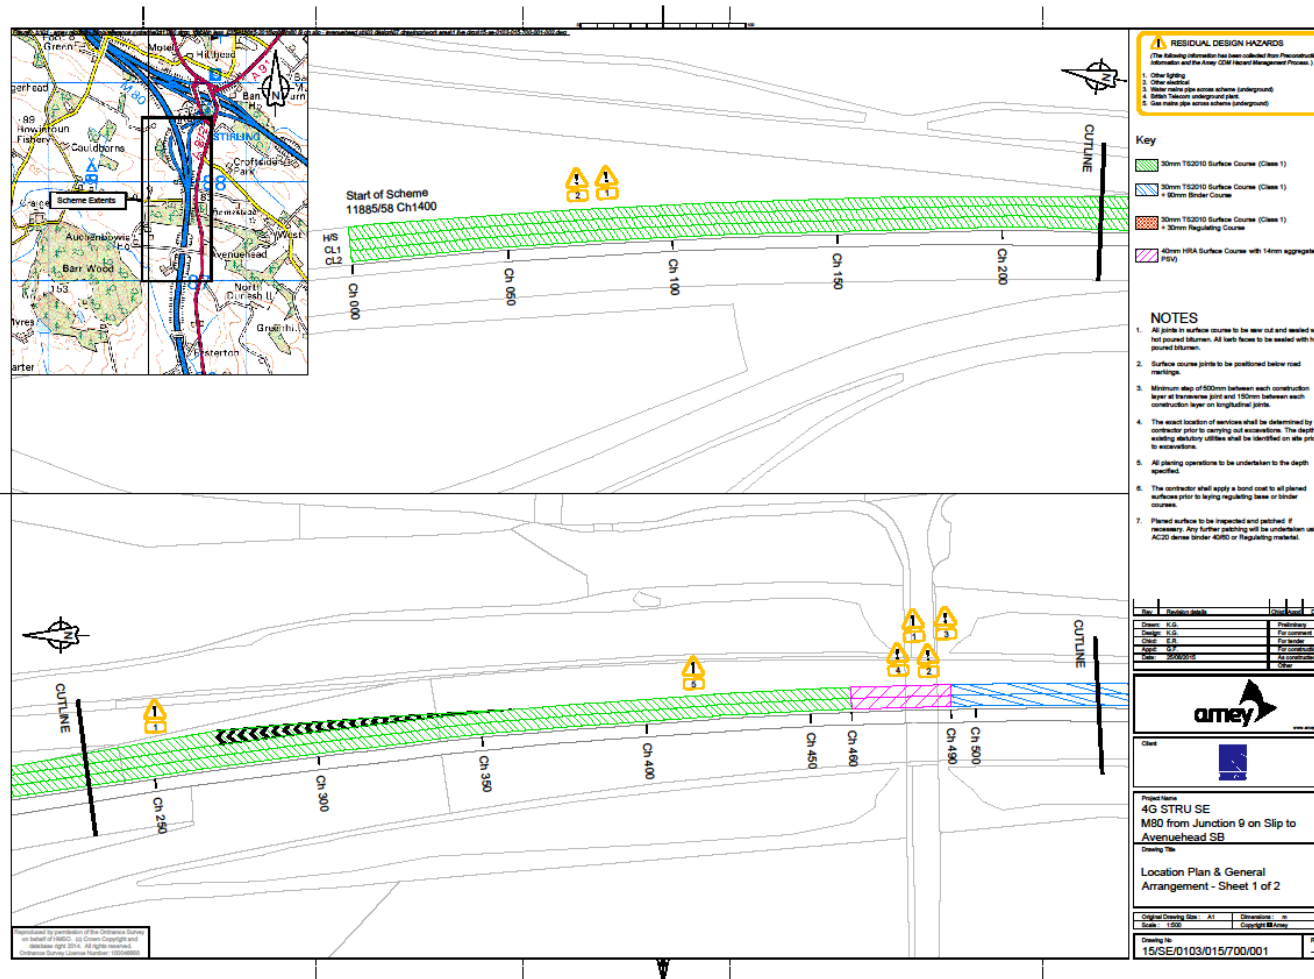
Detailed Location Plan of M80 Trial Site (Part 2)
